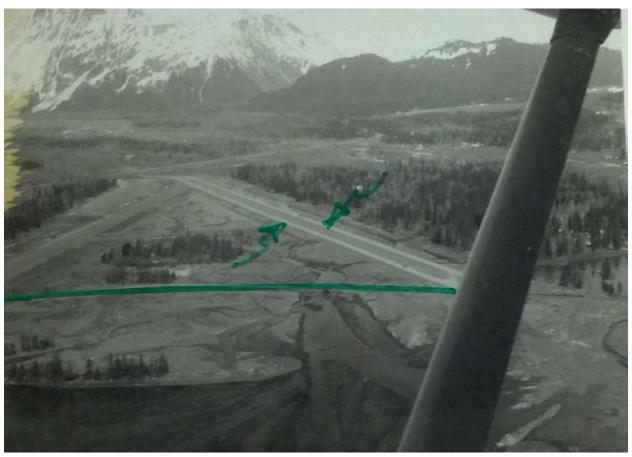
1966 Aerial photo showing abandoned public road (line) and proposed haul routes (arrows) for extending runway 16-30. Photo from DOT&PF archives.
